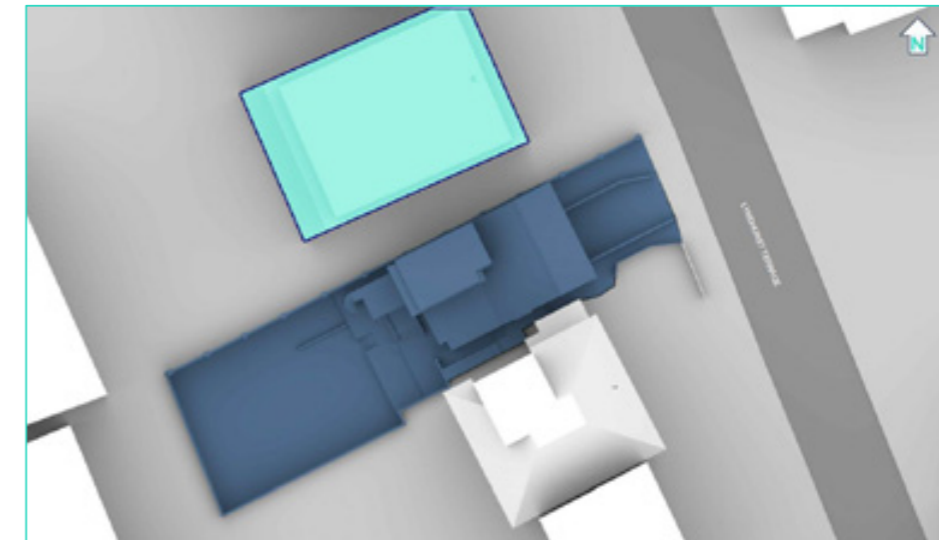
Drawing Number: P2362/05 – 3D View – Proposed Scheme
